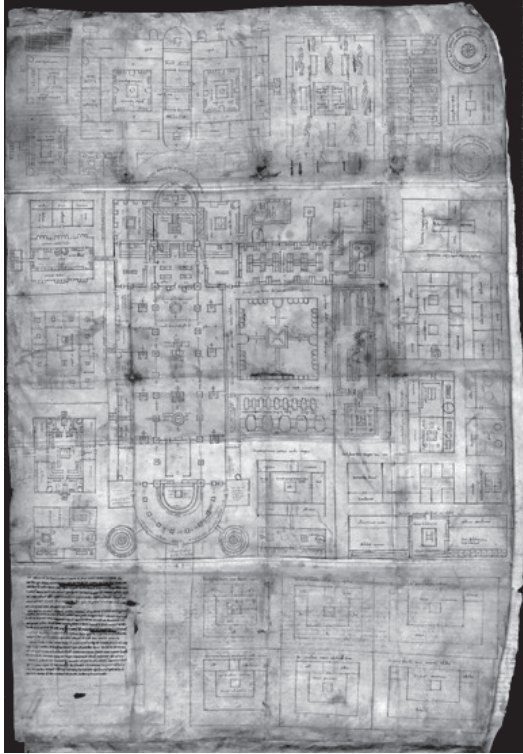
Saint Gall Monastery Plan. [www.stgallplan.org](http://www.stgallplan.org) (Reichenau 820-830)
